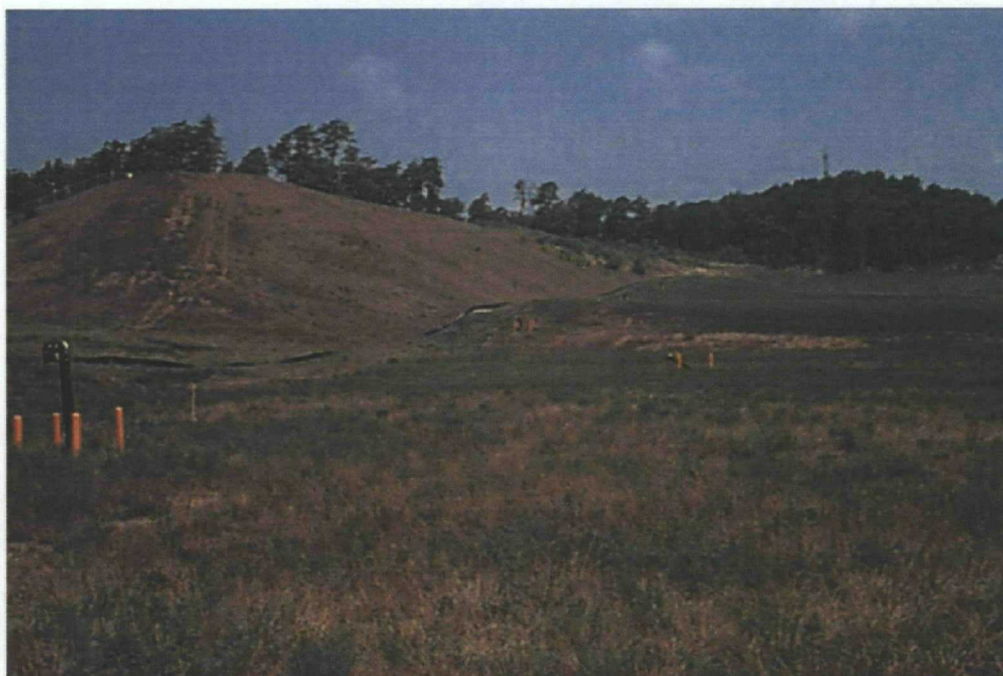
OU2 Landfill, East View, Passive Gas Vent
